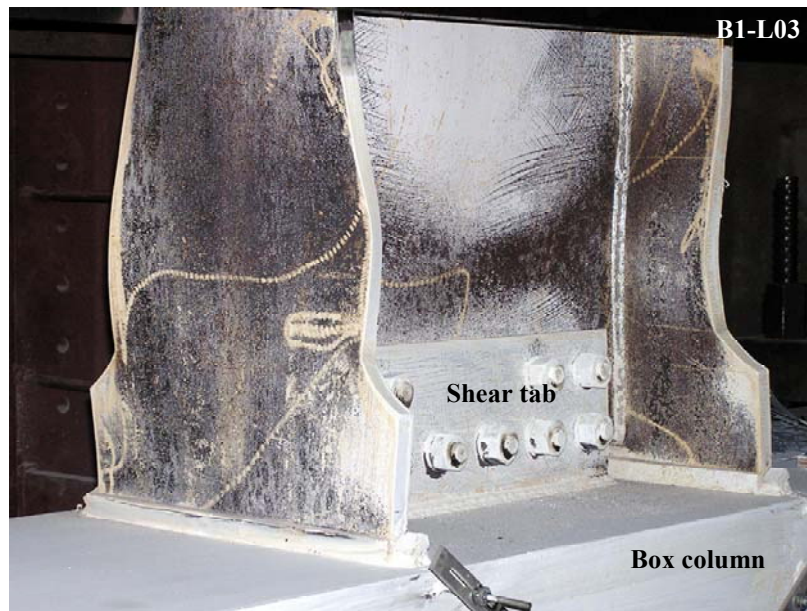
Slight cracking at root of weld access hole of specimen B1-L03 at 4% rad story drift angle.
